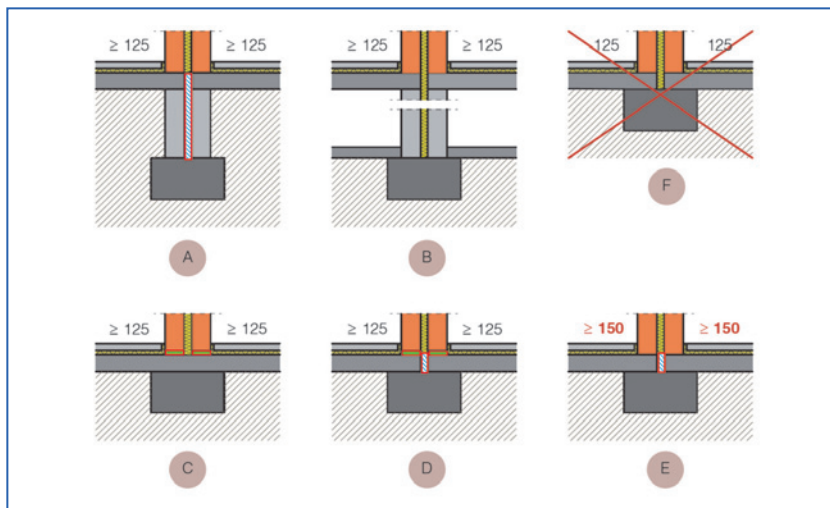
Foundation details to be used to support party walls when the aim is to attain a sound insulation $D_{nT,w} \geq 58$ dB (= normal acoustic comfort for row houses, enhanced acoustic comfort for apartments).
